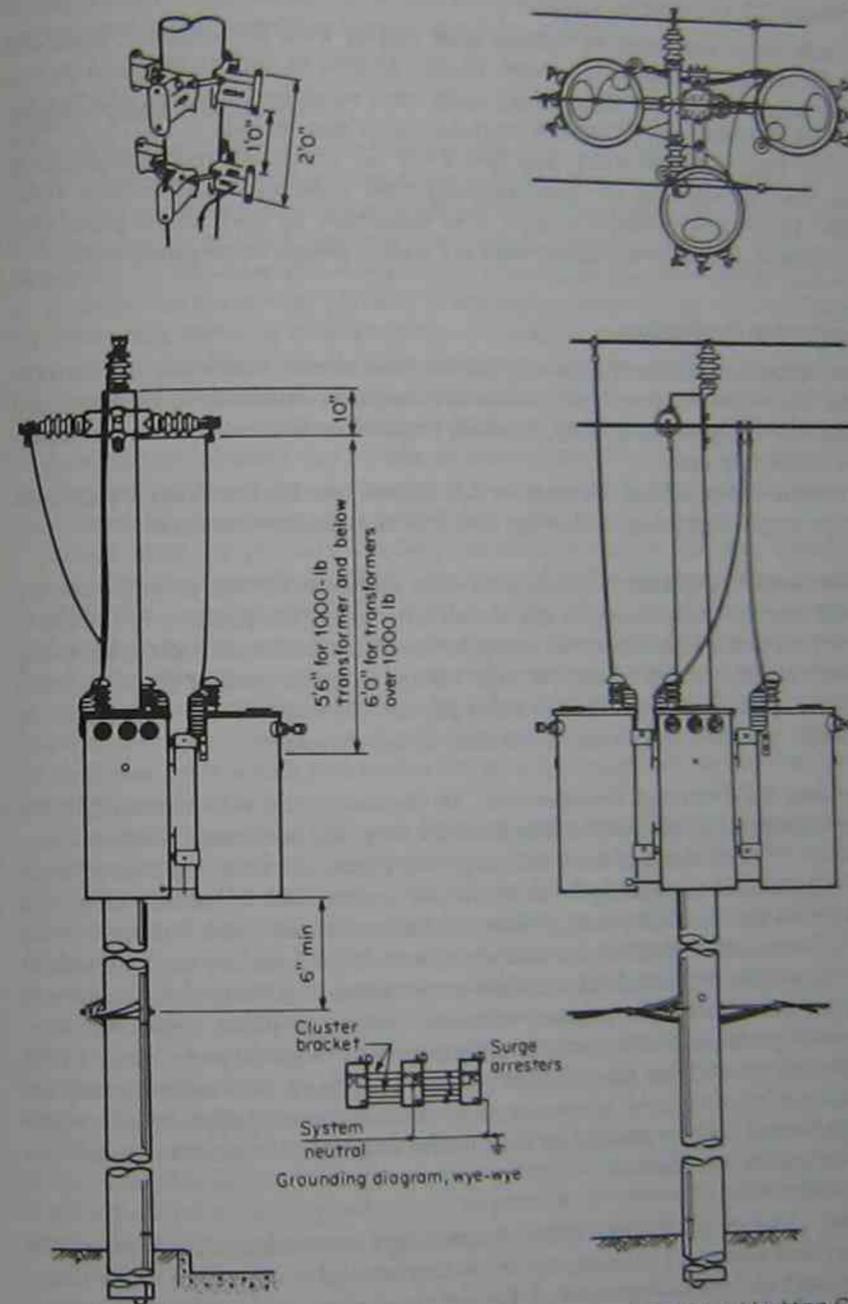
(b) Cluster mounting of transformers. (Courtesy Long Island Lighting Co.)
